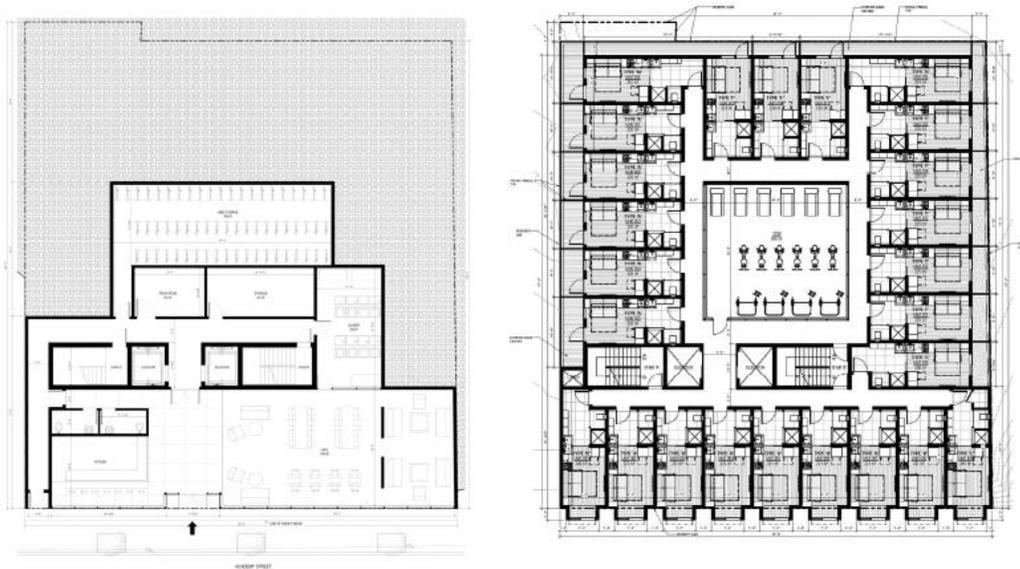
Basement and Ground Floor Plan, Jersey City Micro-Housing proposal, note the ground floor is actually up a story due to the slope in the site.
